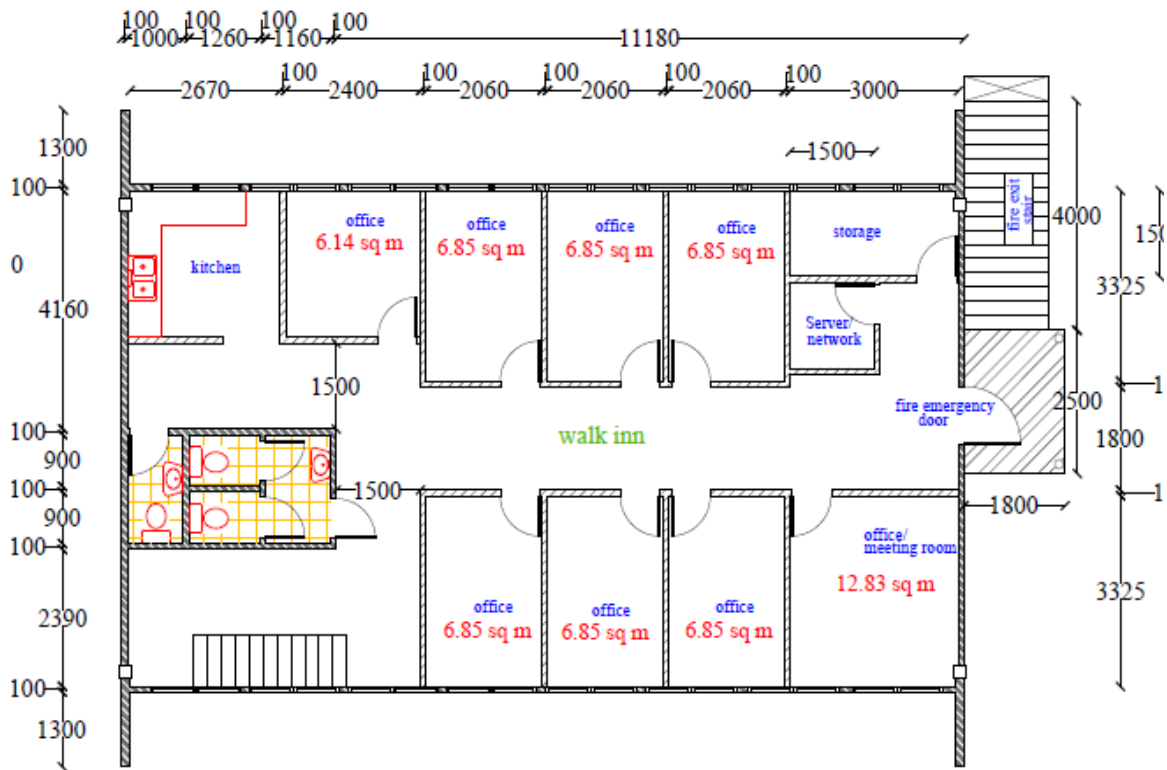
Floorplan SCU building: First Level (Source: Mohangoo, 2020. Project documents SCSRP)
